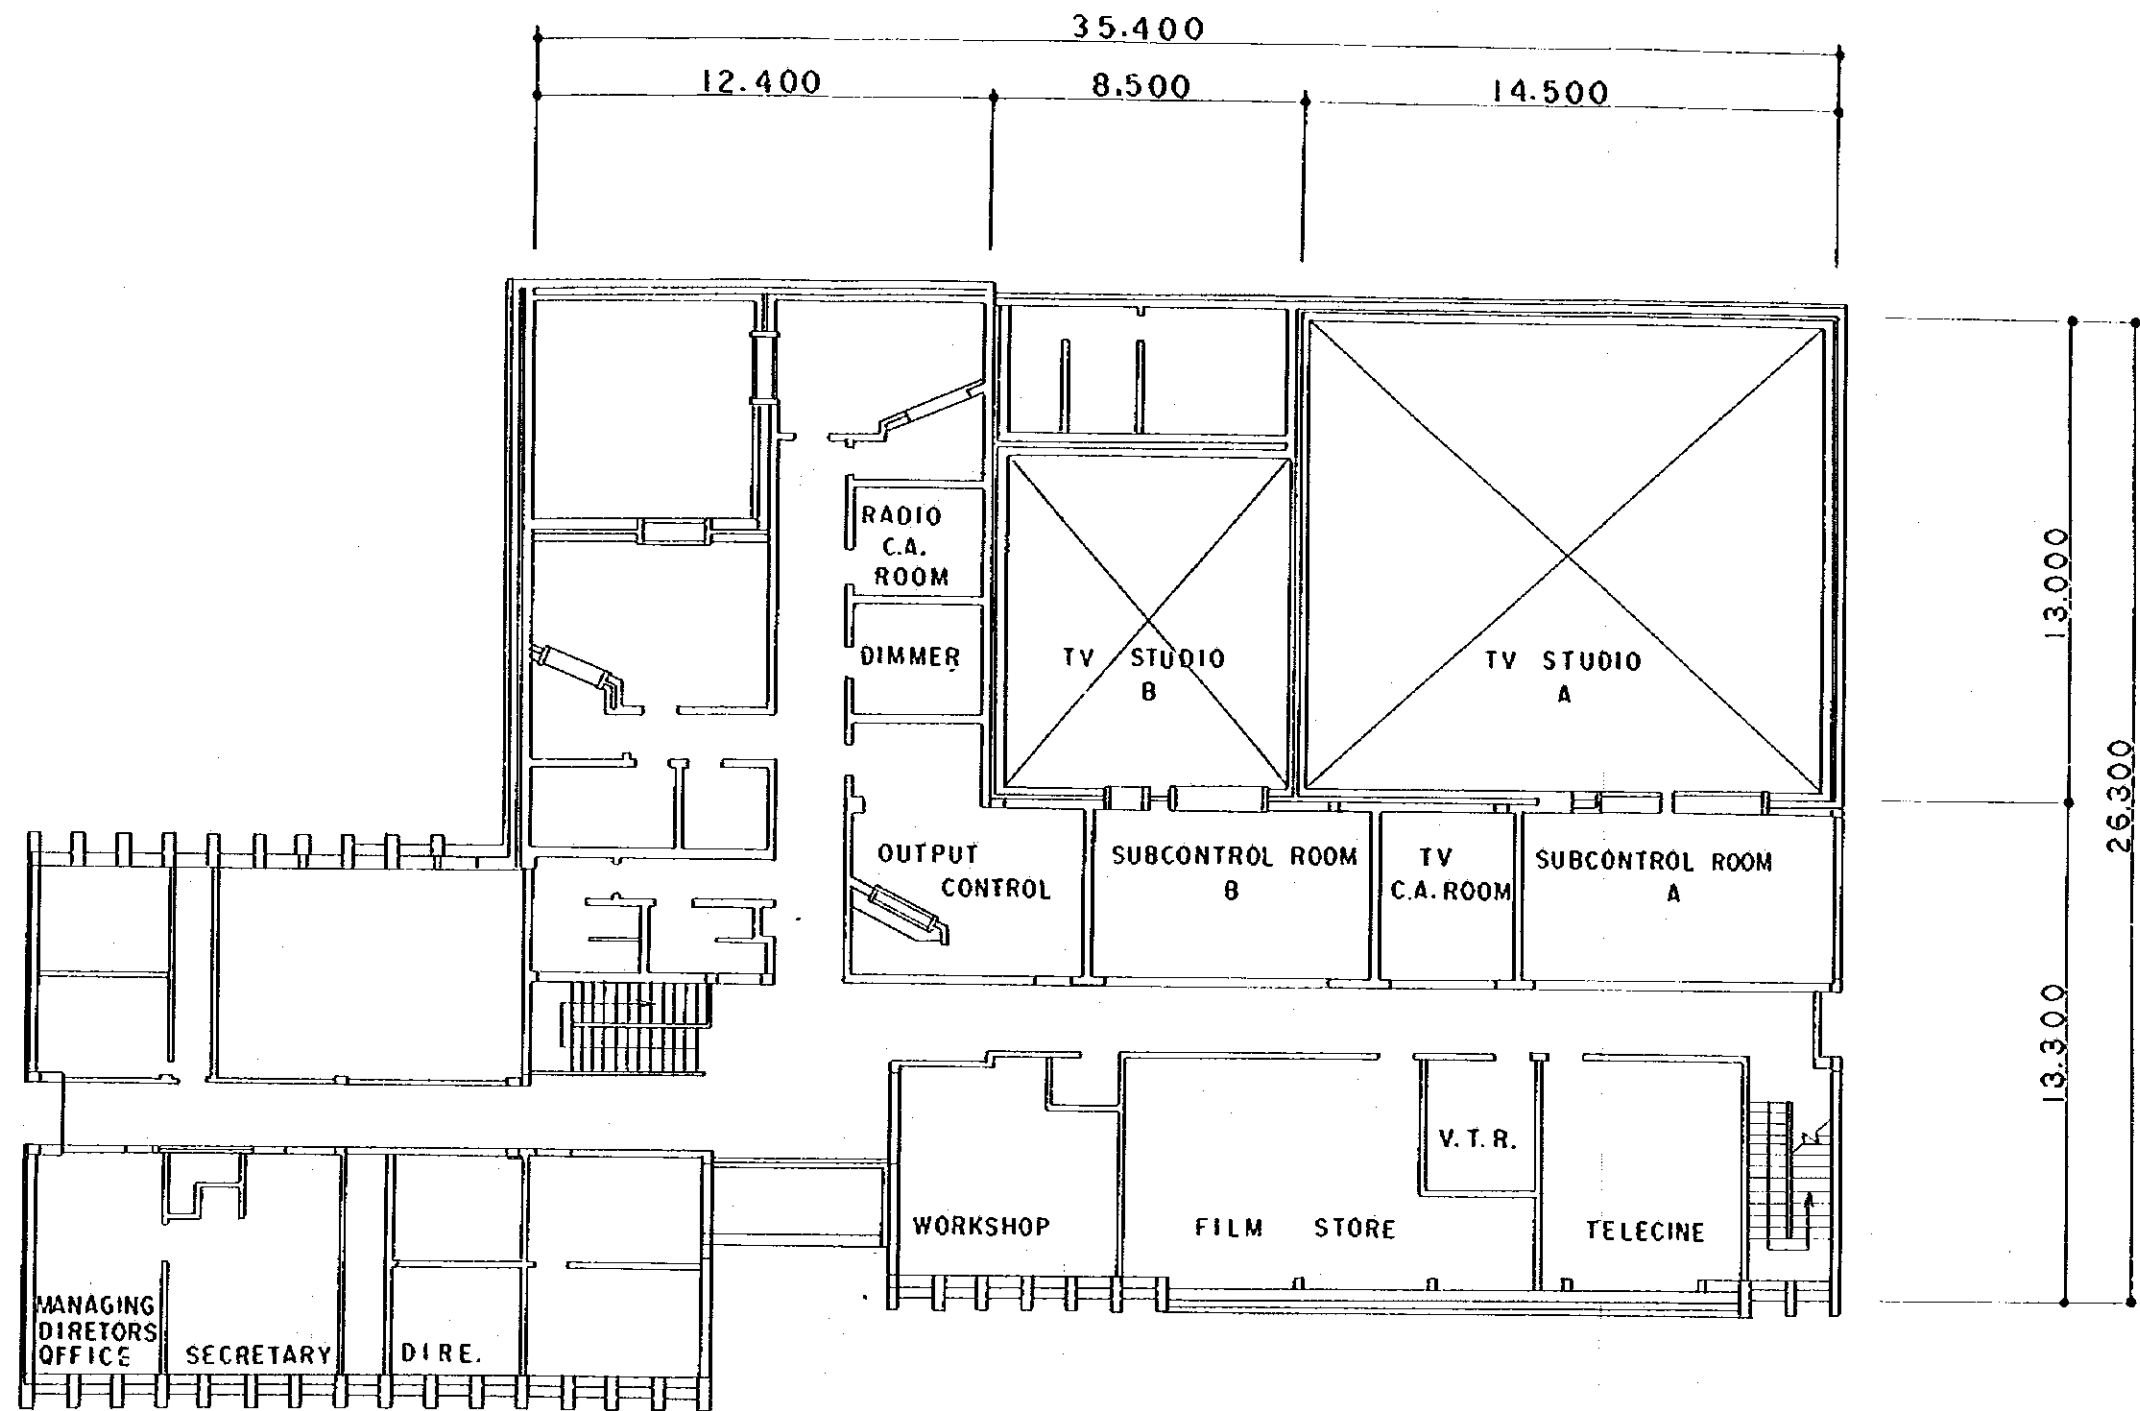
LBS 2nd Floor Plan (Monrovia)
